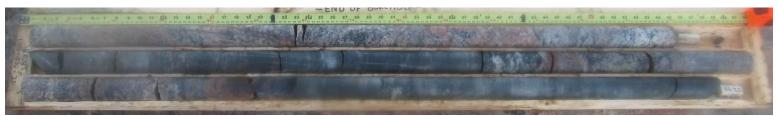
Core Box #8 of 8 (Runs 10-11, 28.1m – 32.4m)
